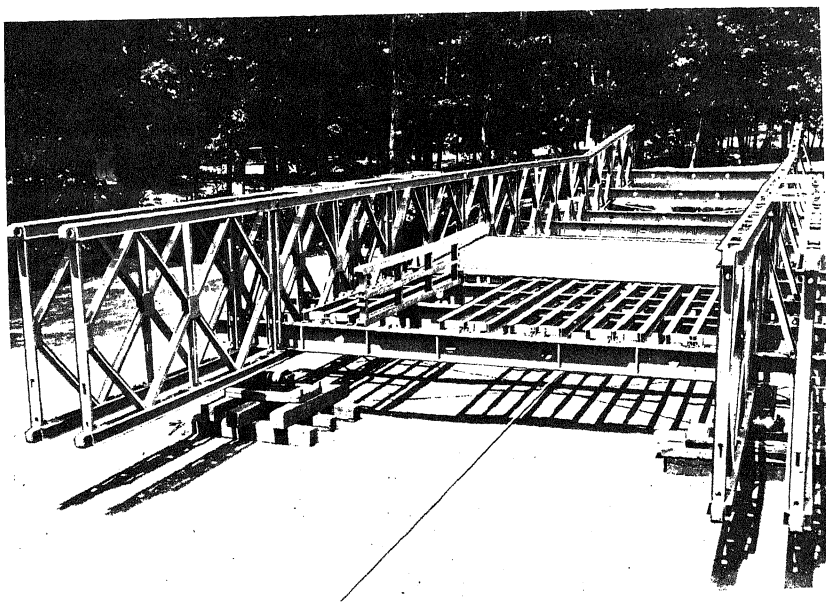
Assembly of remainder of DS bridge—stringers positioned in second bay.
